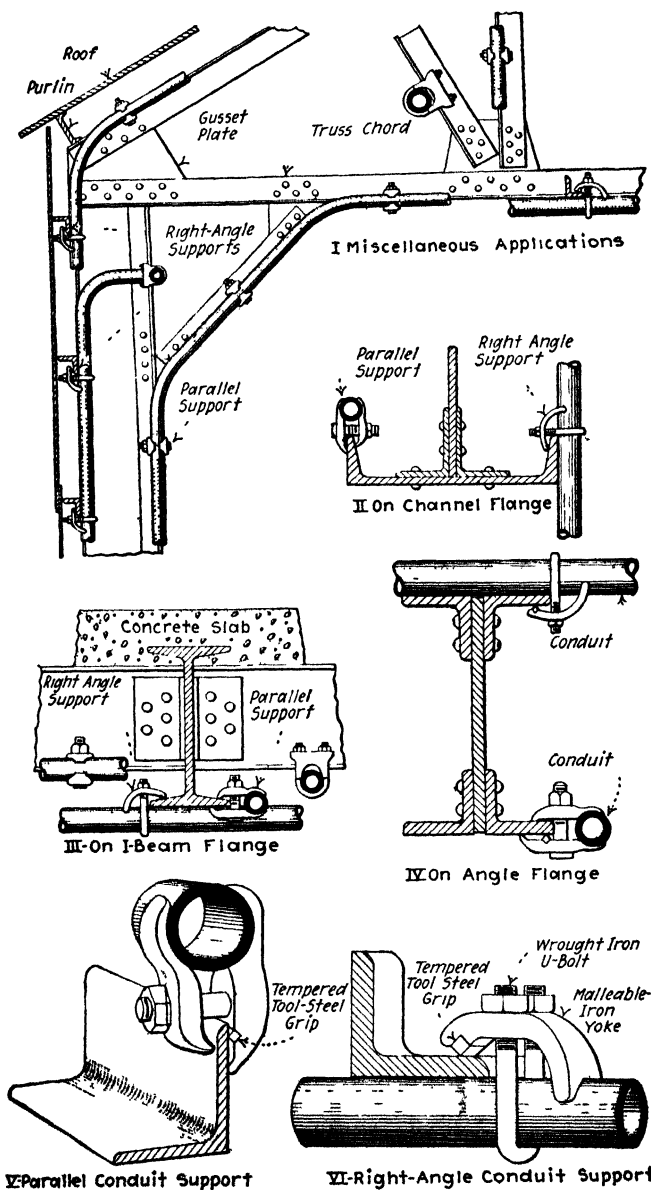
Conduit supports, for structural steel members, made by the C. G. Korns Co., Johnstown, Pa.
